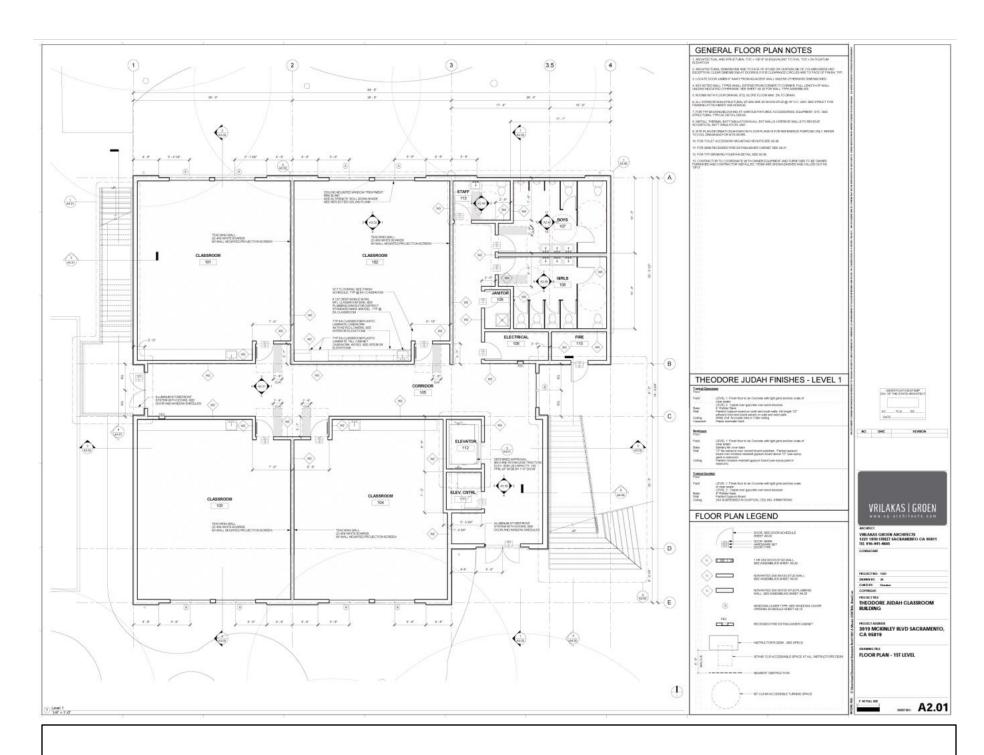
FLOOR PLAN – FIRST FLOOR
